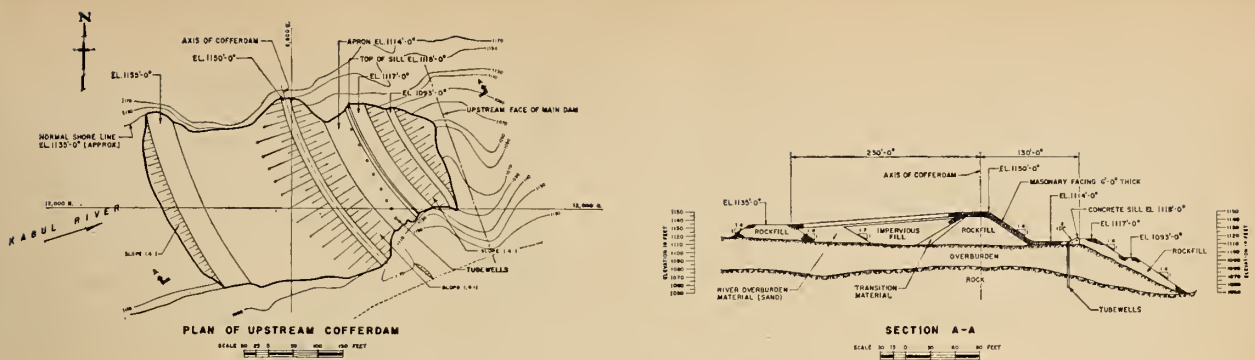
Upstream Cofferdam - Plan (left) and Section (right)
